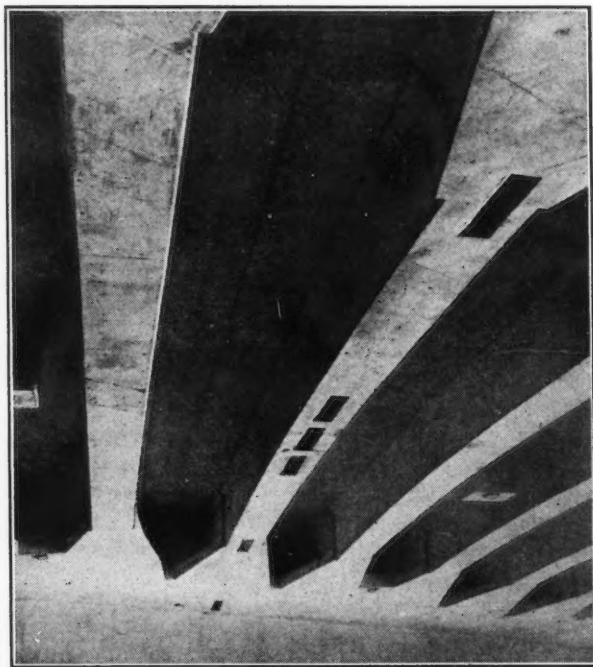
MAIN-FRAME DECK GIRDERS BEFORE CEMENT FINISHING, SHOWING CELLULAR HAUNCHES AND EXTENSOMETER STATIONS
